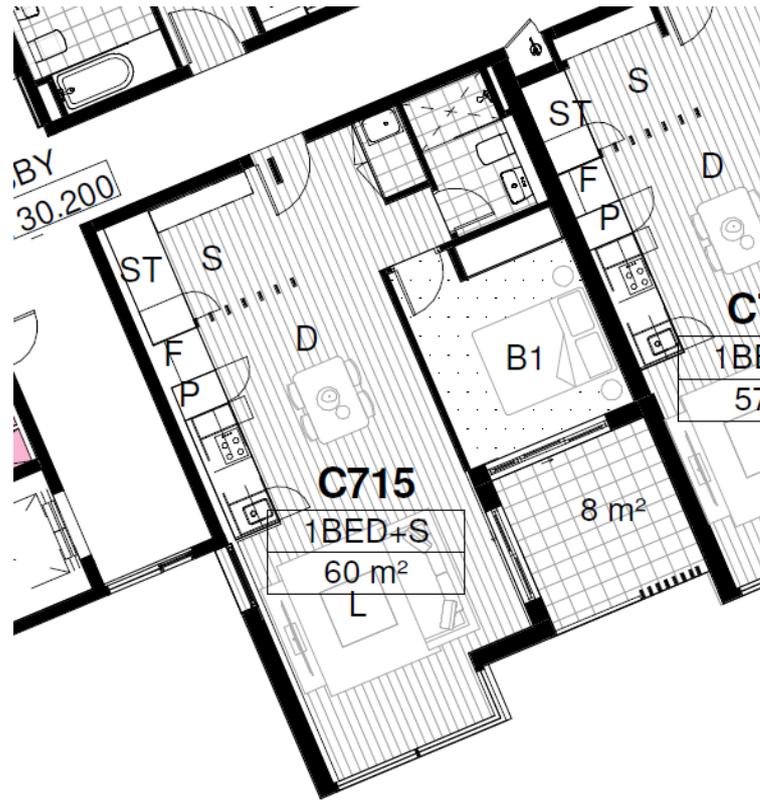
Apartment C715, located on Level 7 of Building C01, which is identified by the applicant as a 'local corner' apartment that is naturally cross ventilated
